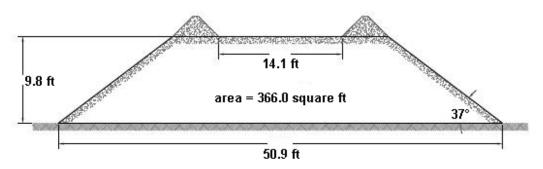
Typical Cross-section Showing Full Fill Portion (Fill Slope 37°)
